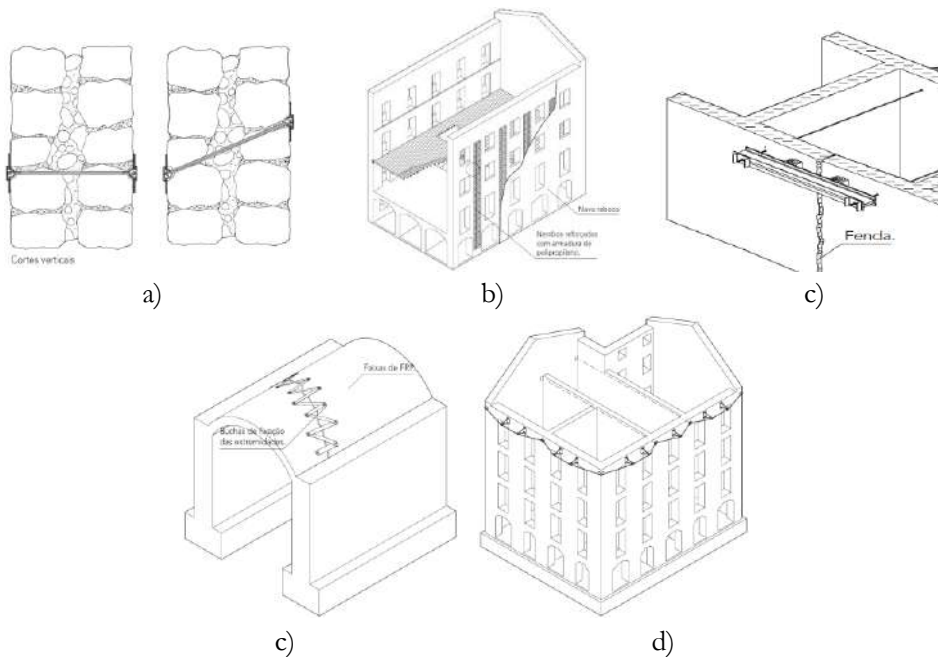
Group 1 of structural solutions proposed in [126], a) the use of tie-rods as confinement of walls, b) the coating of masonry elements, c) reconstitution of masonry elements through rearrangement of masonry units and reparation of local damage, d) the reconstitution of masonry sections using other materials, and e) the insertion of new structural elements.
